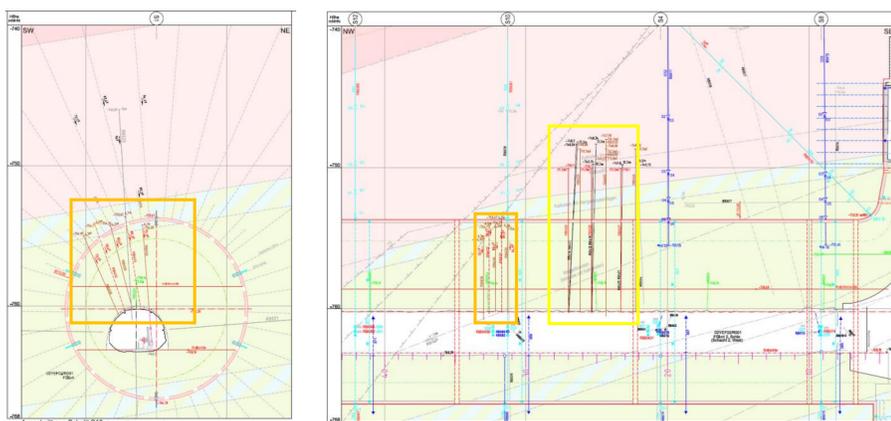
Pilot tests performed in claystone (light green) on weakness planes (yellow rectangle) and EDZ (orange rectangle) – The dimension of the future excavation and the (outer) shotcrete lining is also given. Note the gaps in the shotcrete liner!
